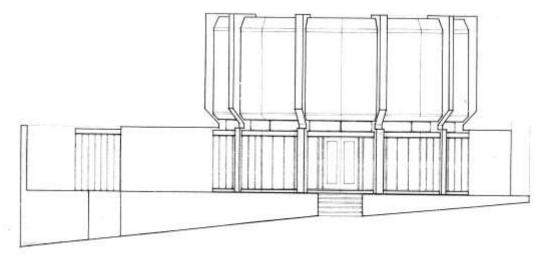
Austin-Smith, Salmon, Lord Architects planning application drawing for the south elevation of the public house (Source: Exeter City Council Planning)
